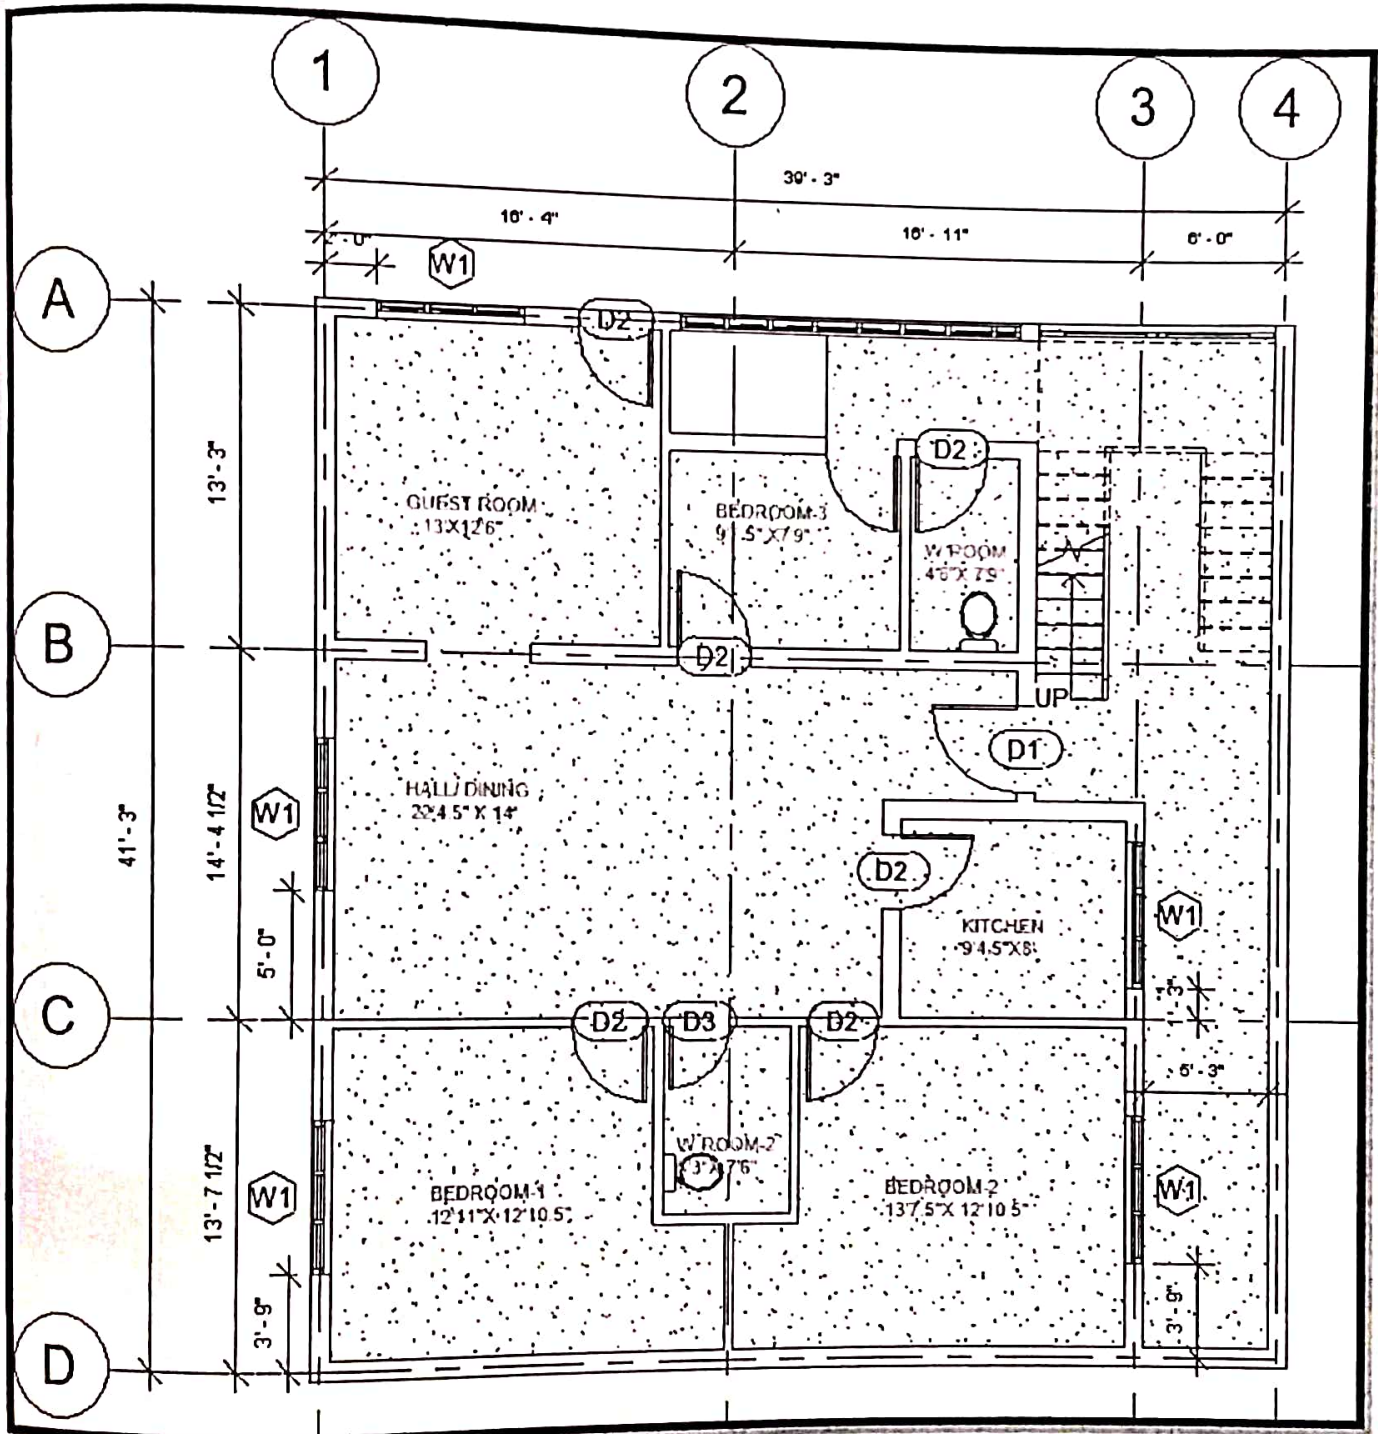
1<sup>ST</sup> LEVEL PLAN
